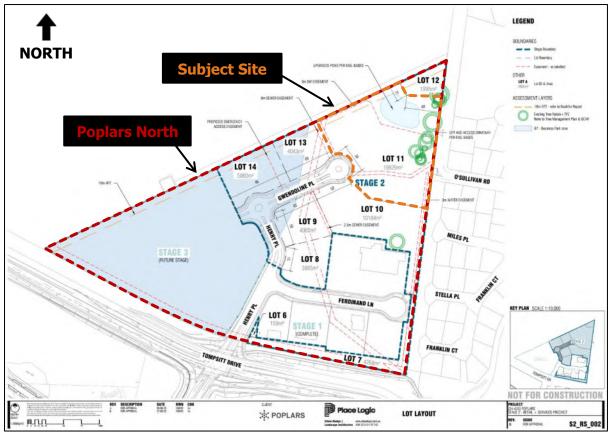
Proposed Lot Layout Plan (source: DA.2023.0348)
